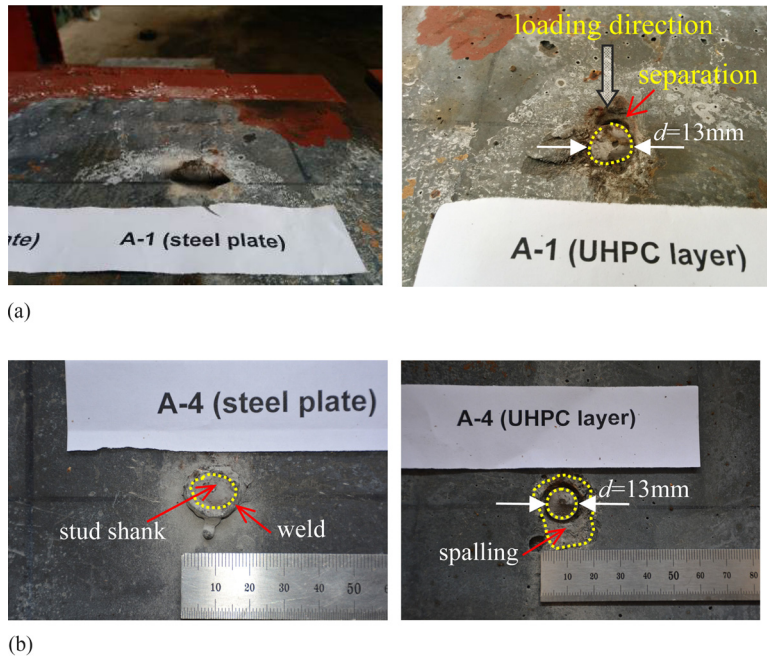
Two fatigue fracture positions in headed studs: (a) Fracture Position 1 (weld); (b) Fracture Position 2 (stud shank)
